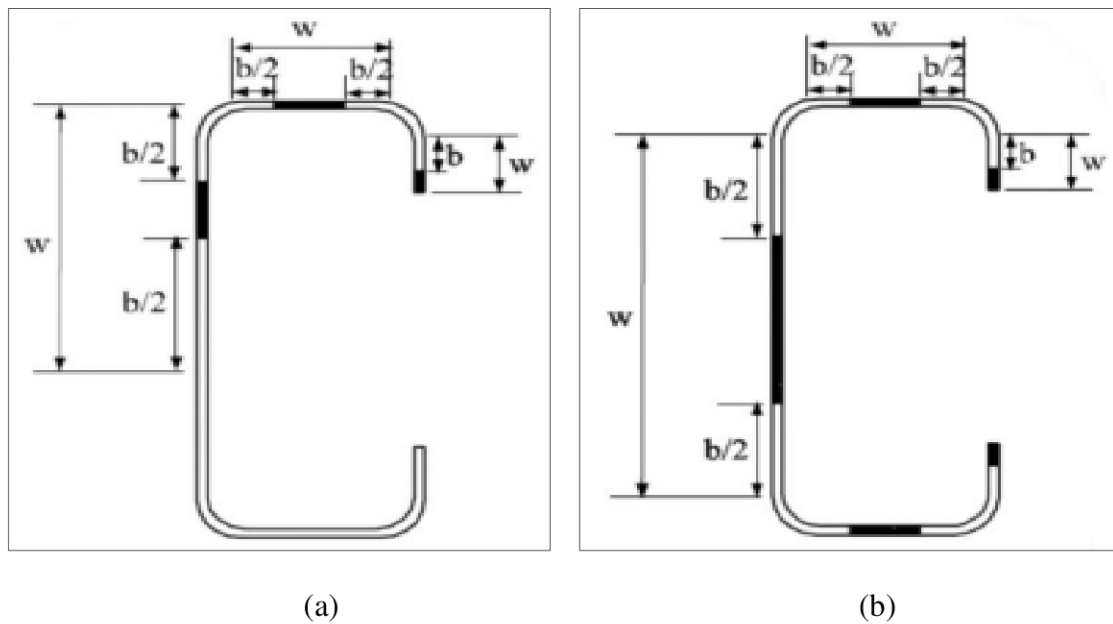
Effective widths of C-Section: (a) Bent element; (b) Compressed element (Djelil, 2019).
